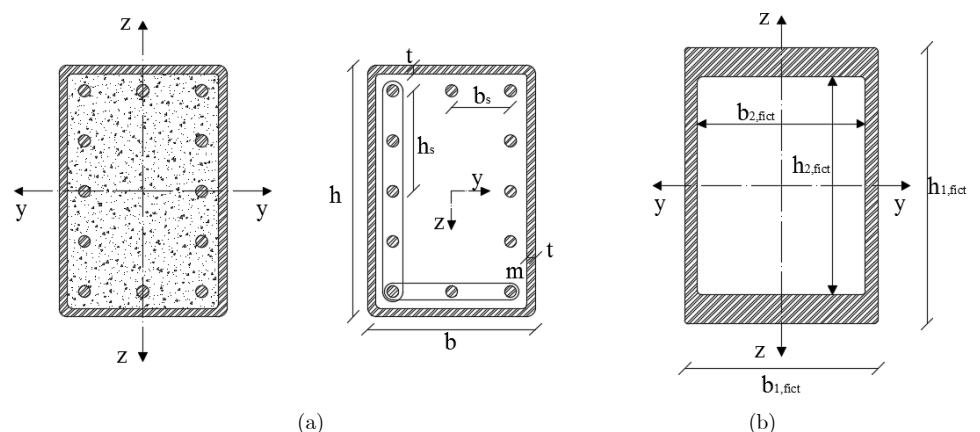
Geometric characteristics of the (a) composite concrete-filled and (b) fictitious pure-steel rectangular hollow section.
